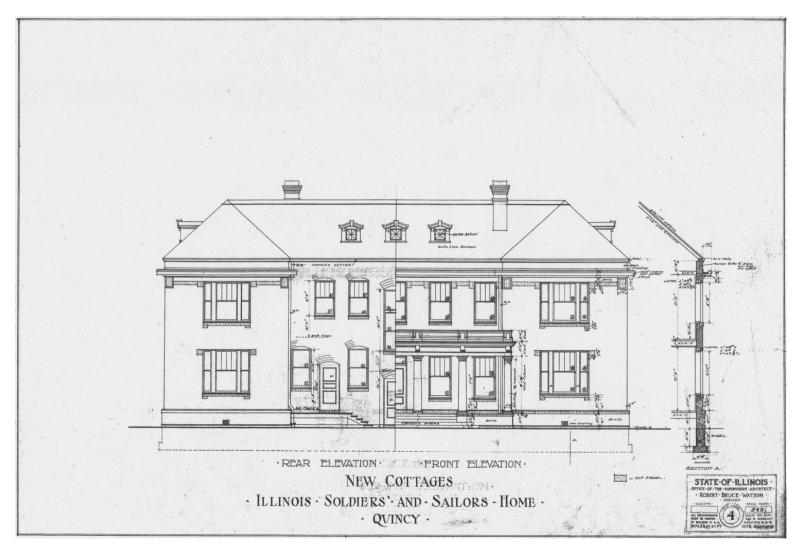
Front and rear elevation views of Building 11/Rowland Barracks, as originally designed (1905). A sectional through the west wall of the south wing also is shown.
